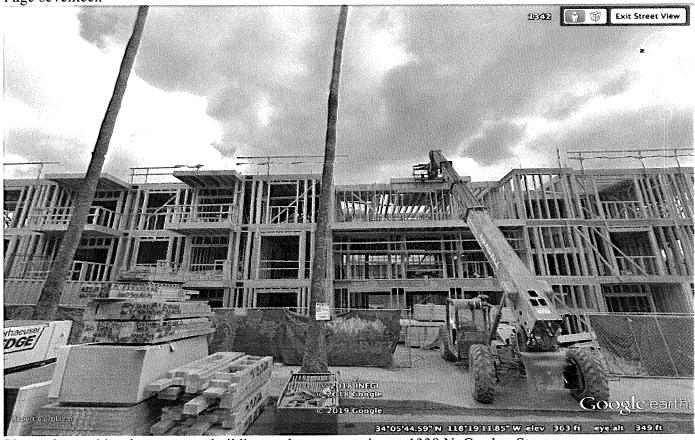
unit apartment building under construction at 1338 N. Gordon St.
